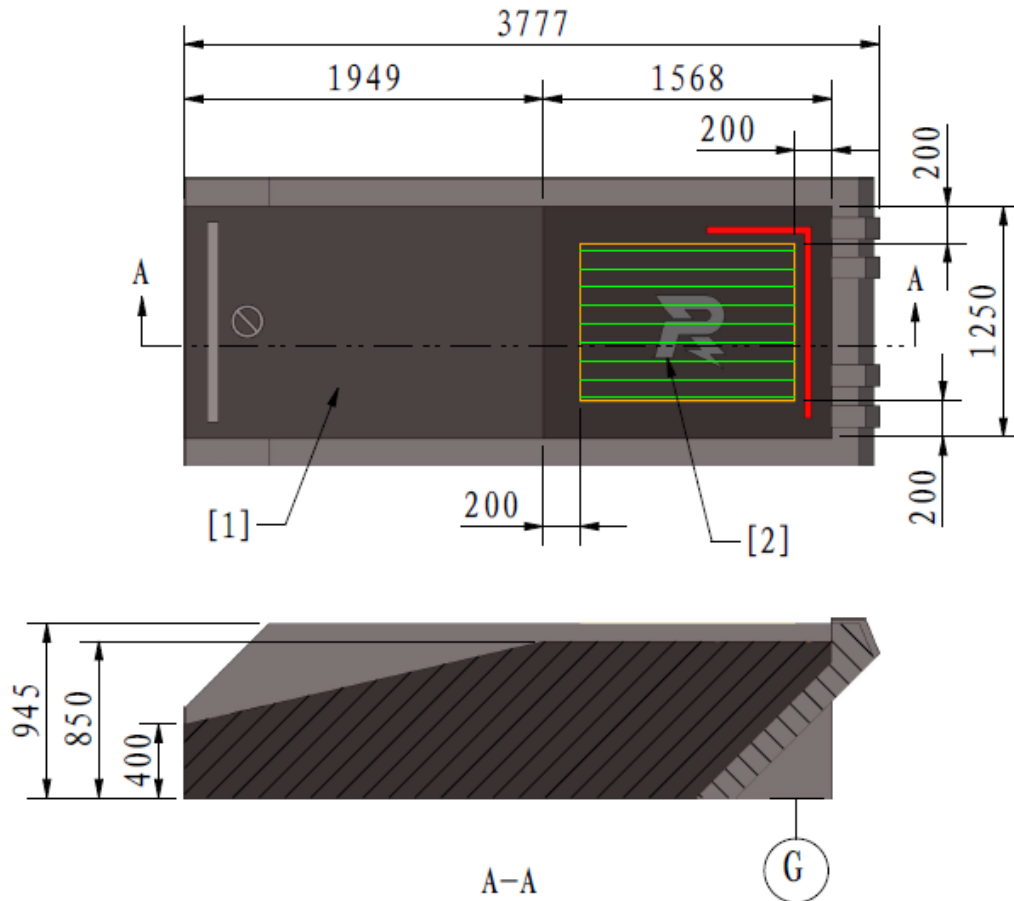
R4 Trapezoid-Shaped Elevated Ground
